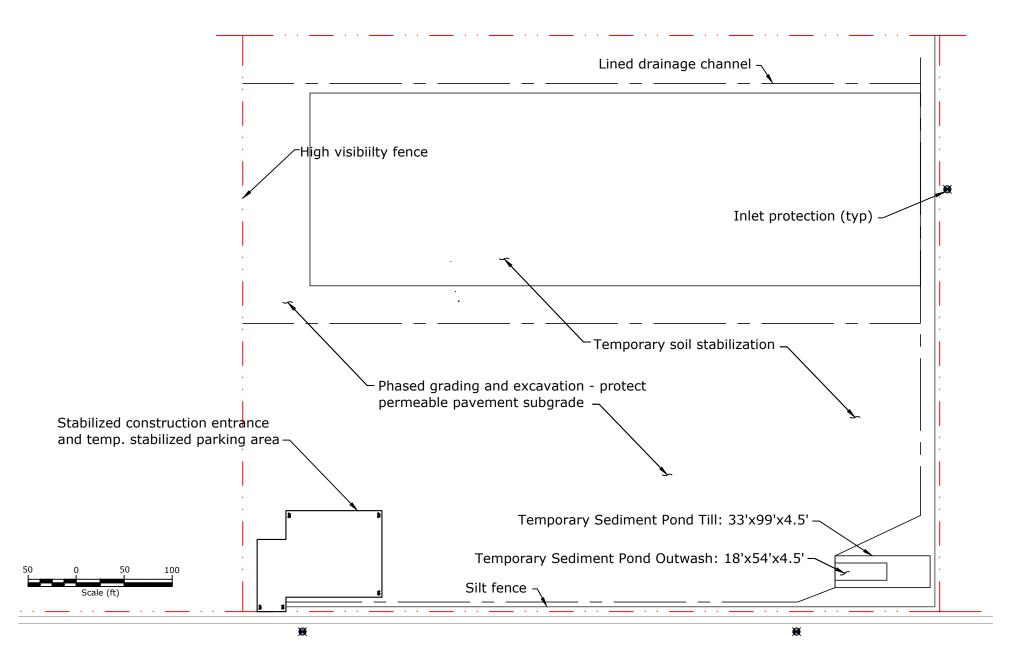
Scenario 13 and 14. Temporary Erosion and Sediment Control Plan – Large Commercial Development Plan, 2012 Requirements
